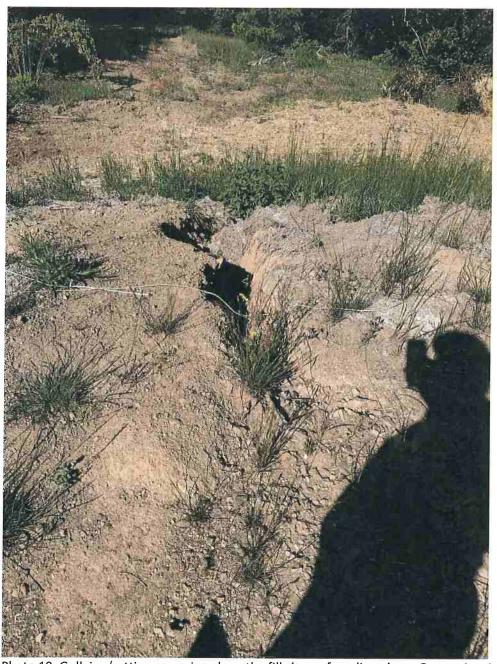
Gullying/rutting occurring along the fill slope of grading above Conversion Area #2 (Observation Point 2(b)) from water running off of the graded area.
